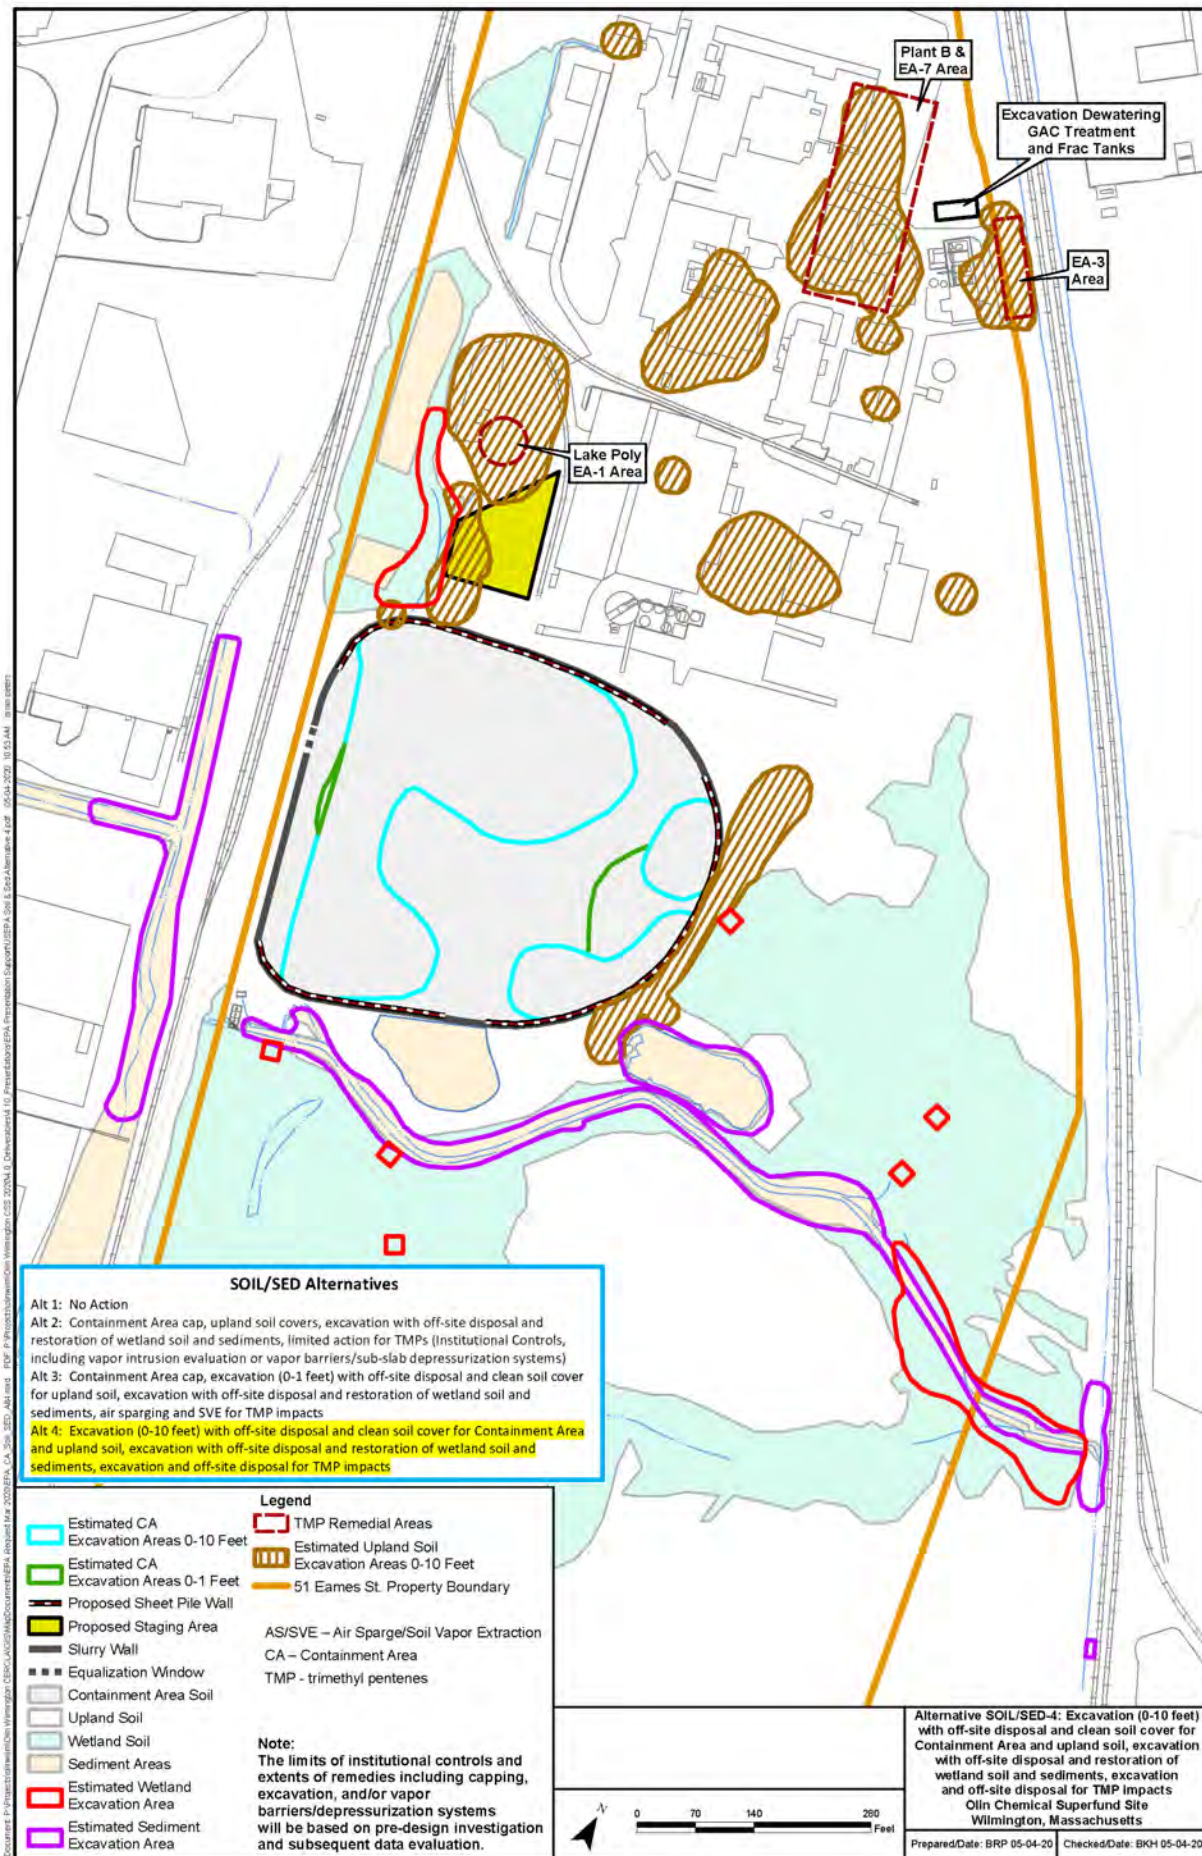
Conceptual plan for Alternative SOIL/SED-4. Excavation (0-10 feet [ft]) with off-site disposal and clean soil cover for Containment Area and upland soil, excavation with off-site disposal and restoration of wetland soil and sediments, and excavation and off-site disposal for trimethylpentenes (TMPs).
